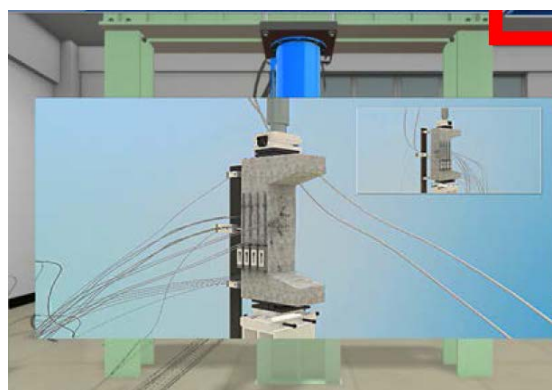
Virtual Simulation Project of Eccentric Compression Test of Reinforced Concrete Short Columns
